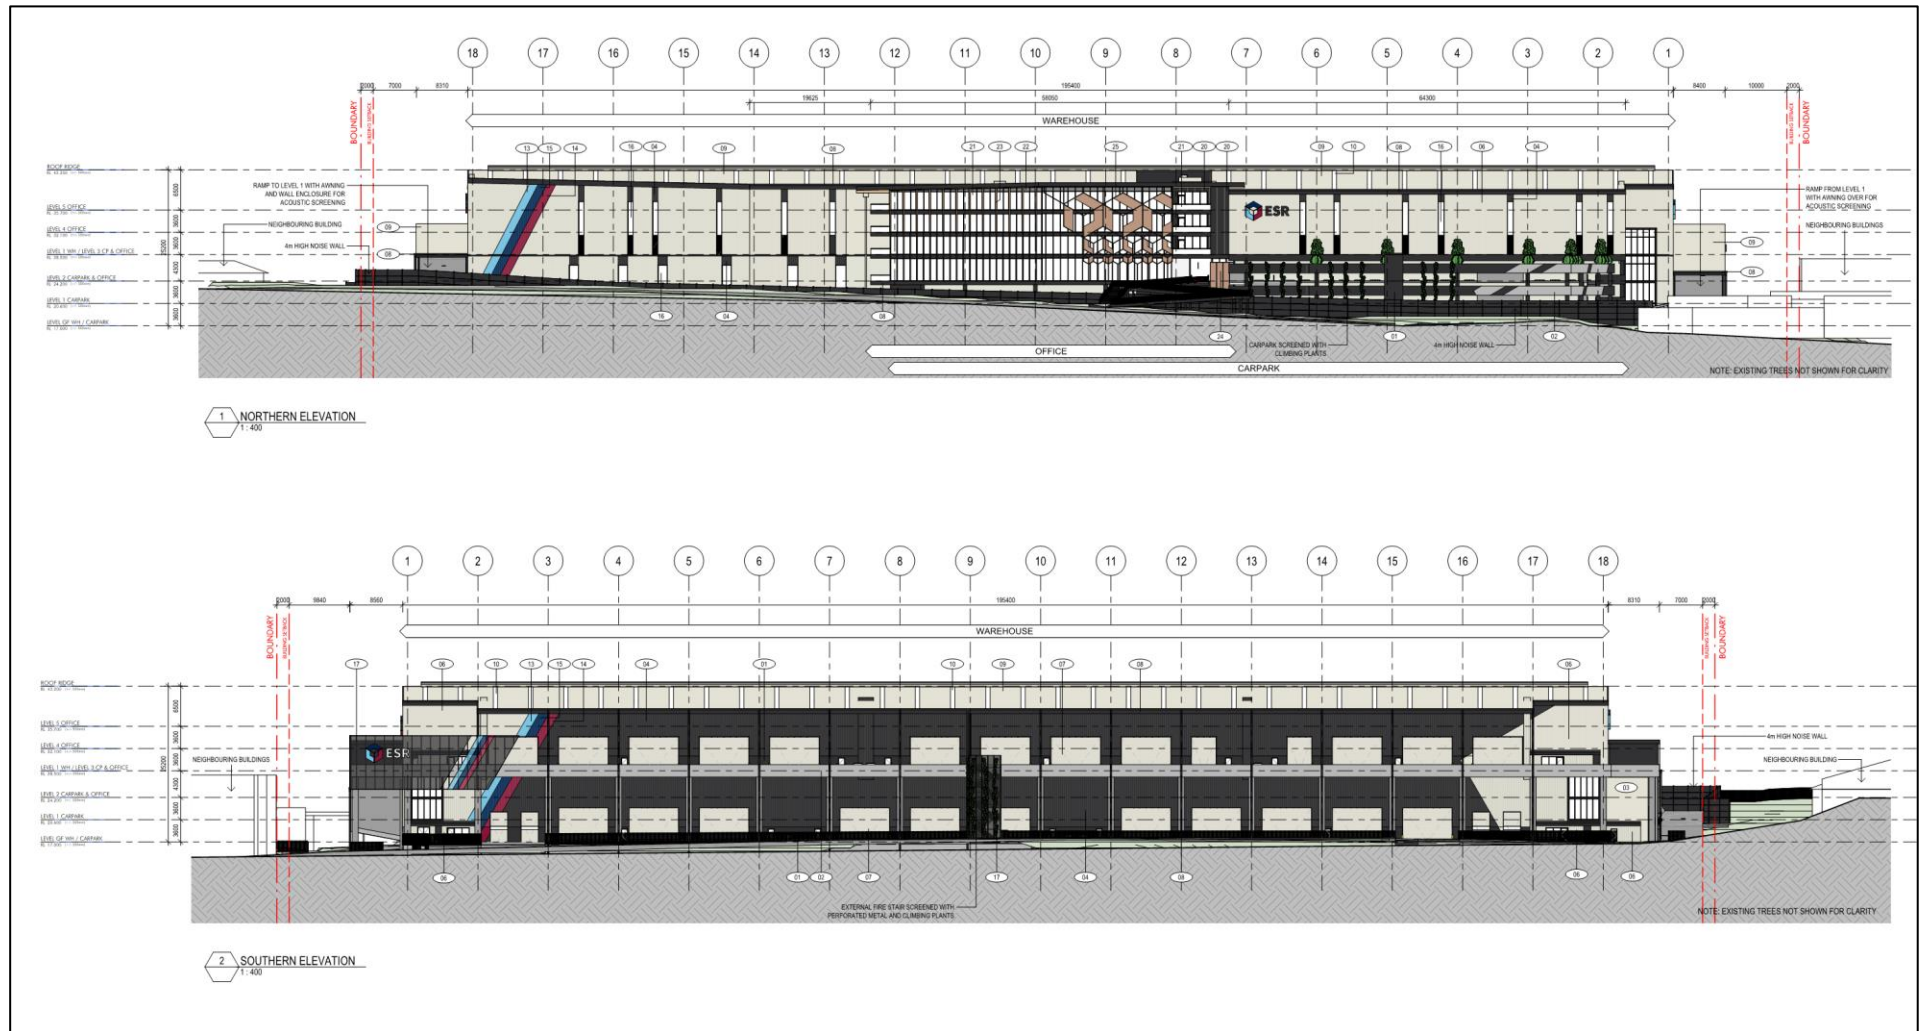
North and South Elevations (Nettletontribe Architects, 2024)
